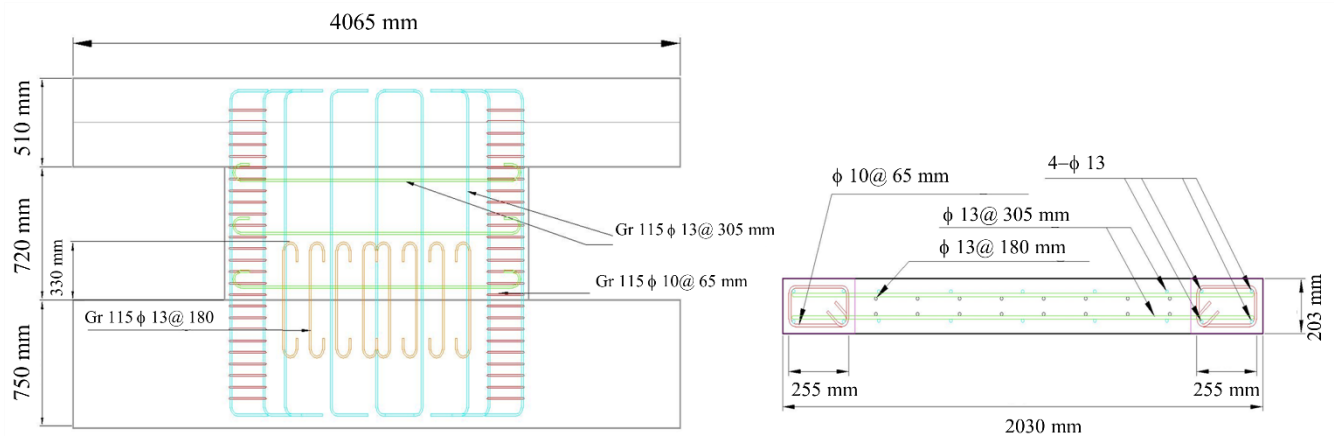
Reinforcement details of the high strength squat shear wall (Cheng et al. 2021).
